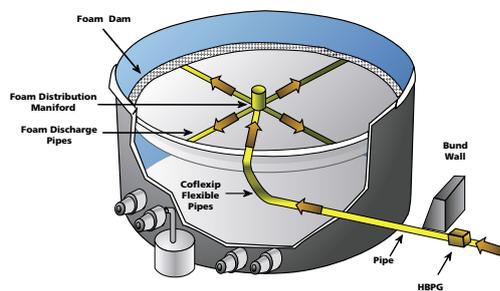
“Coflexip” System Protection of Open Top Floating Roof Tanks
